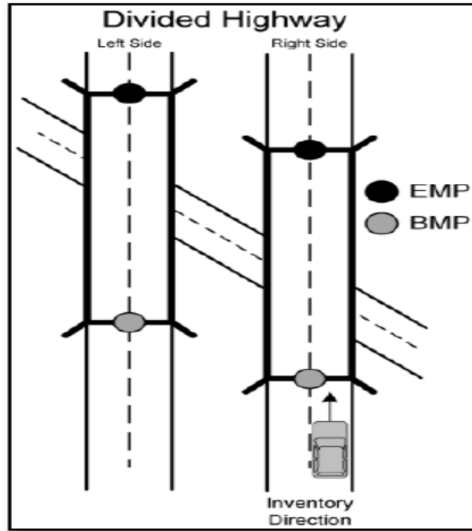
BMP and EMP of bridge on left/right side of divided highway (FDOT, 2016a)
